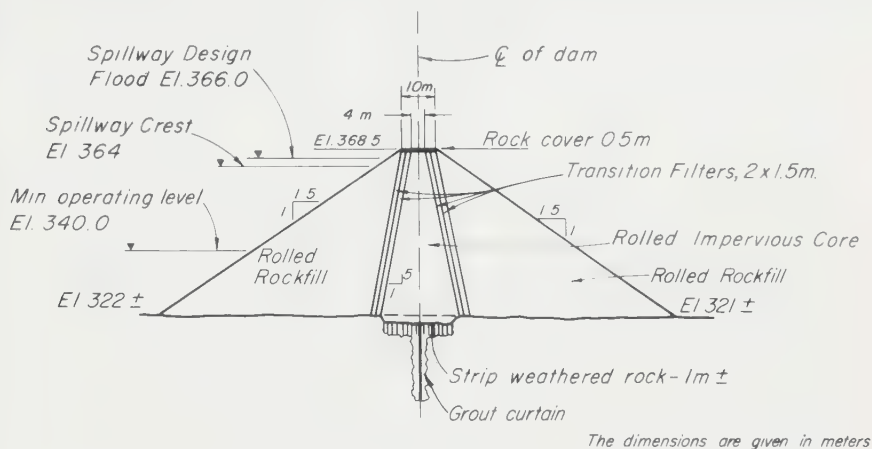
Cross section of Hanabanilla Dam, Cuba.
